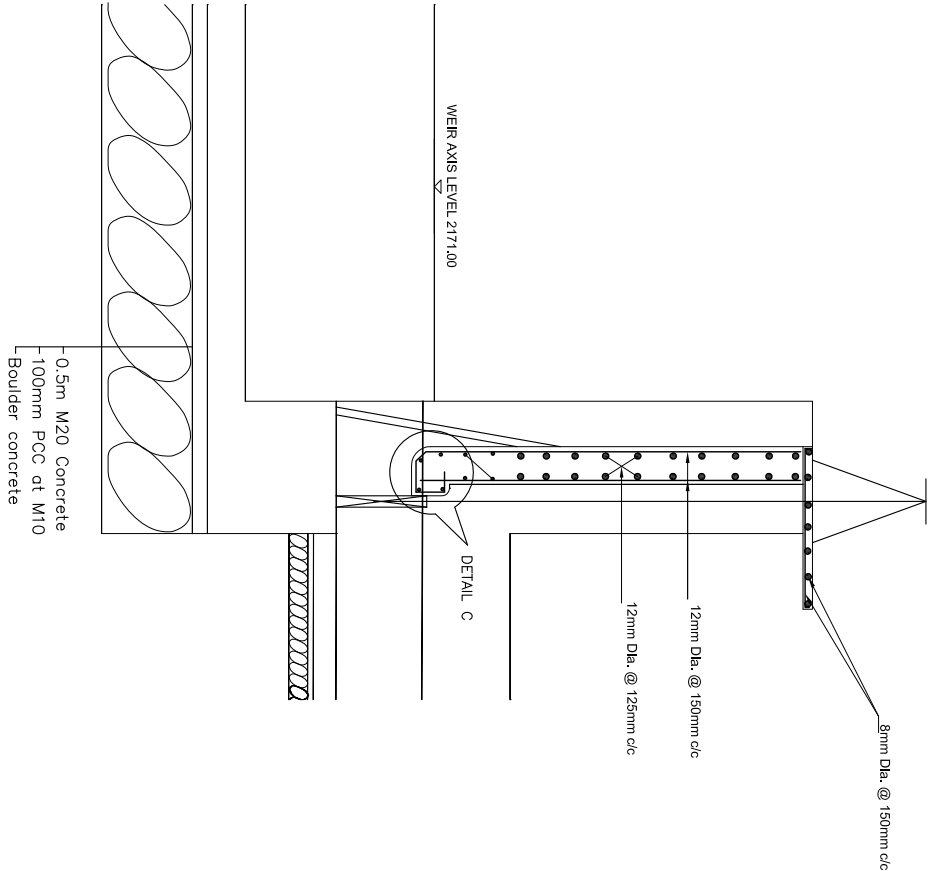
DETAILS OF GRAVEL TRAP, SPILLWAY AND UNDERSLUICE SECTIONS
